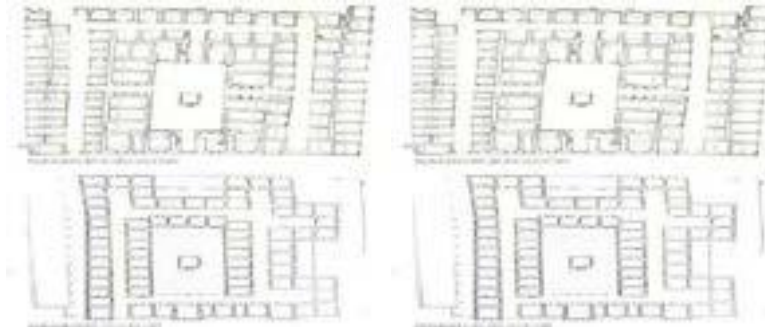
Kızlarağası Inn Ground Floor Plan (left) and First Floor Plan (right) (Asadollahi Asl Zarkhah, Tuna Ultav, & Ballice, 2022)
